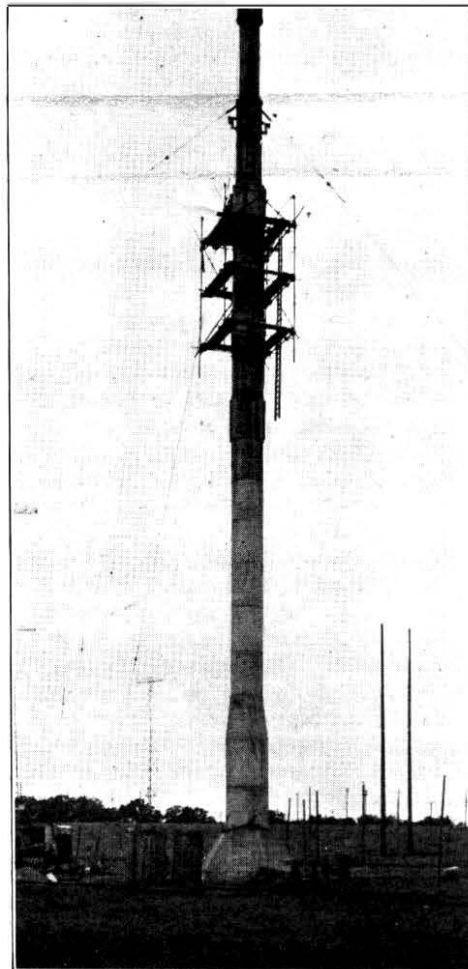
LIGHT SUSPENDED PLATFORM.
